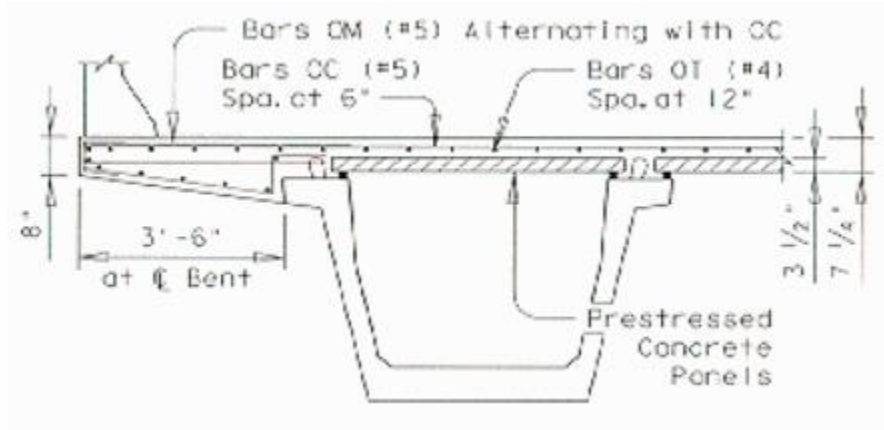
Typical Cross Section of Southbound Louettea Road Superstructure showing the Deck Overhang
